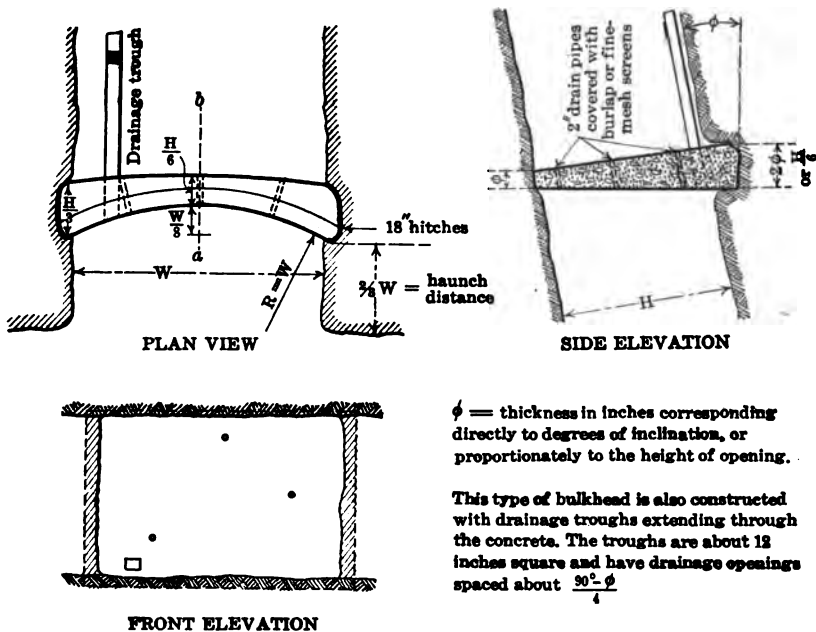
Concrete or brick bulkhead for pitch workings.
